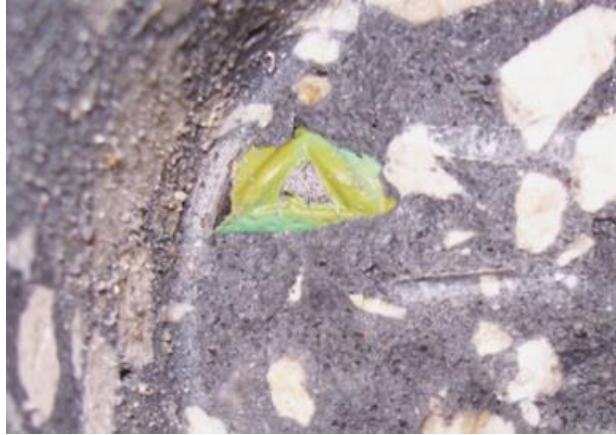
Rebar at core #5 site. Note poor adhesion of epoxy coating.
